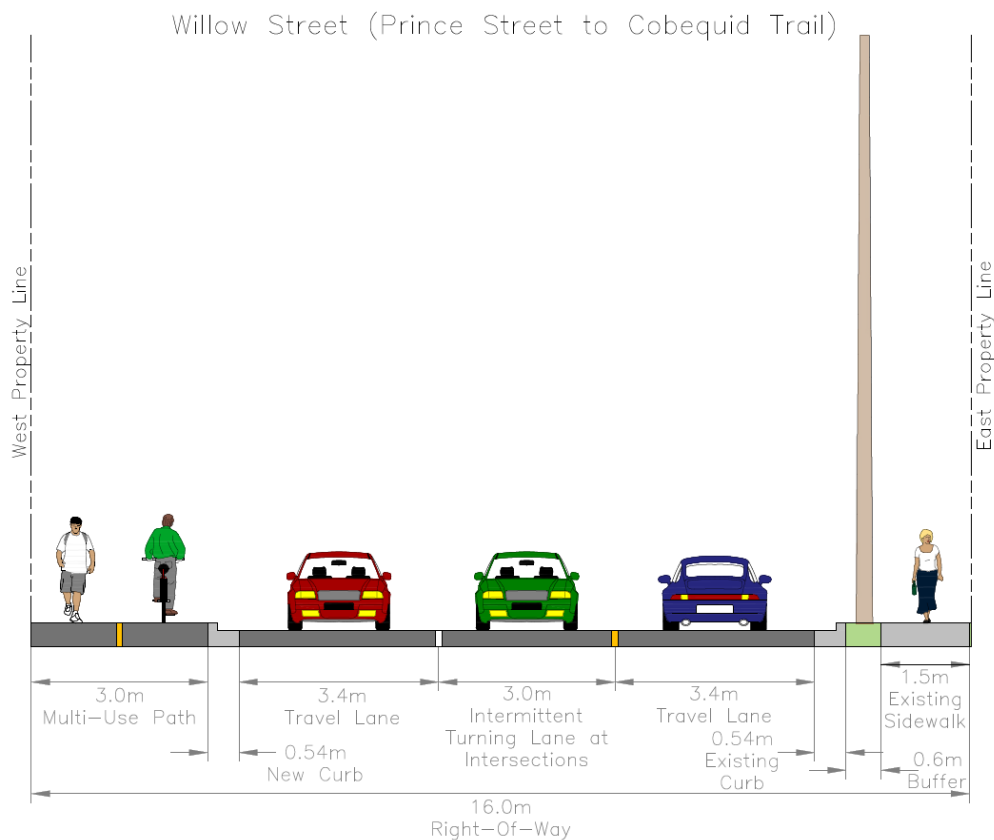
Willow Street between Prince Street and the Cobequid Trail, Revised Cross Section
